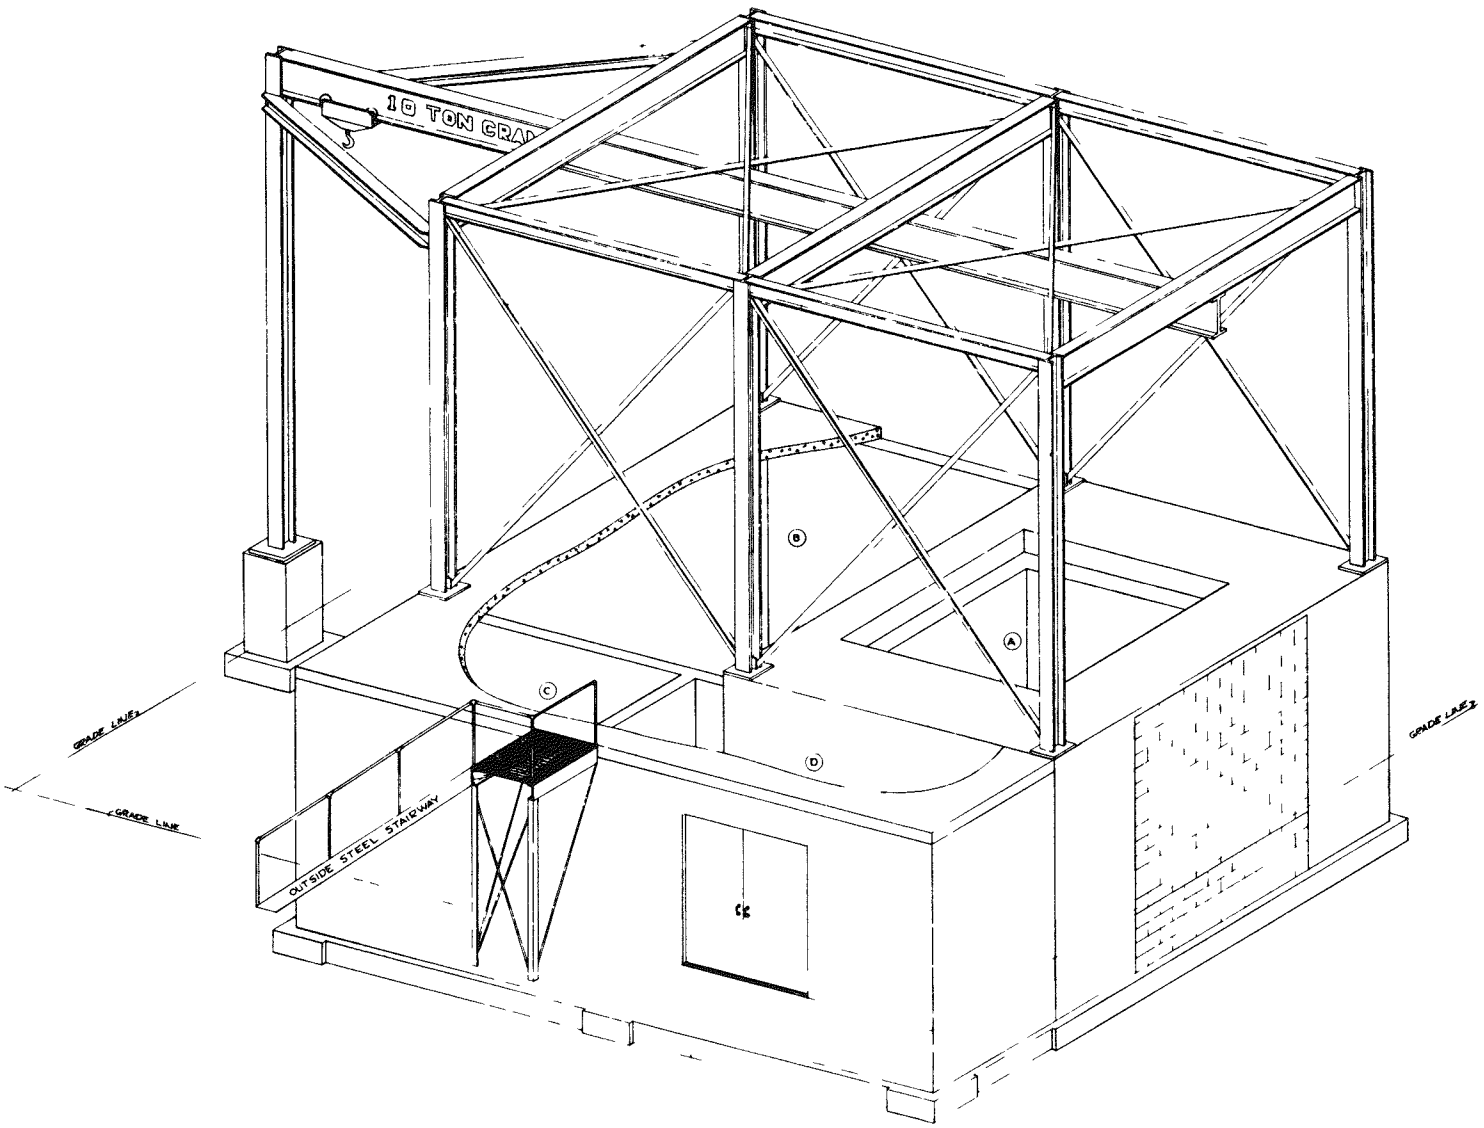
Proposed Test Fixture - Plans Elevation and Plot Plan
